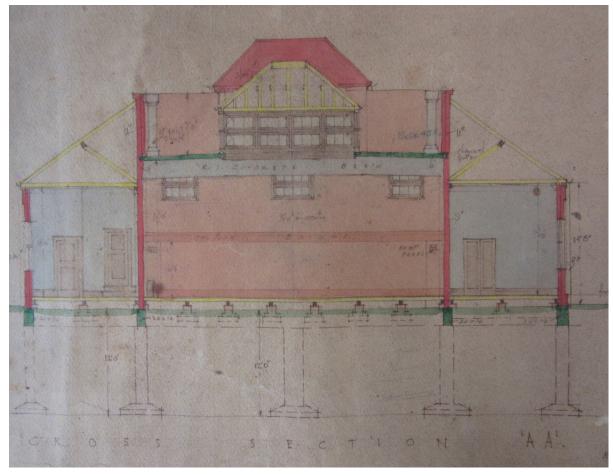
Section from the construction drawing showing the lantern in cross section (roof timbers coloured yellow). The pitched roof to the lantern was not built. A lower cost flat roof was built. The red roof behind the lantern is the rear stair roof. It is not known if the column vents at the terrace rear corners were built. The piles and piers are shown. Source: WC LSC.
